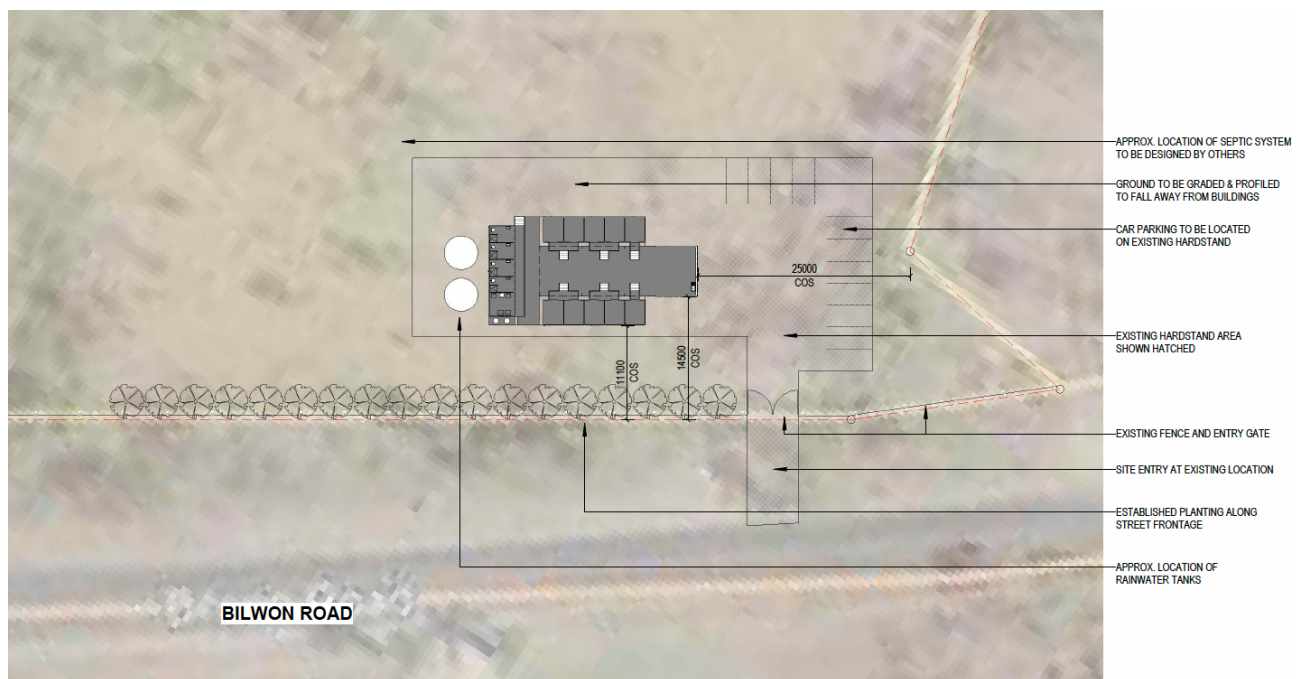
Extract from Development Plans (Prepared by U&i Town Plan.)
